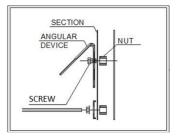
Screw anchors for the fixing of the bracket support (reinforced concrete wall)
